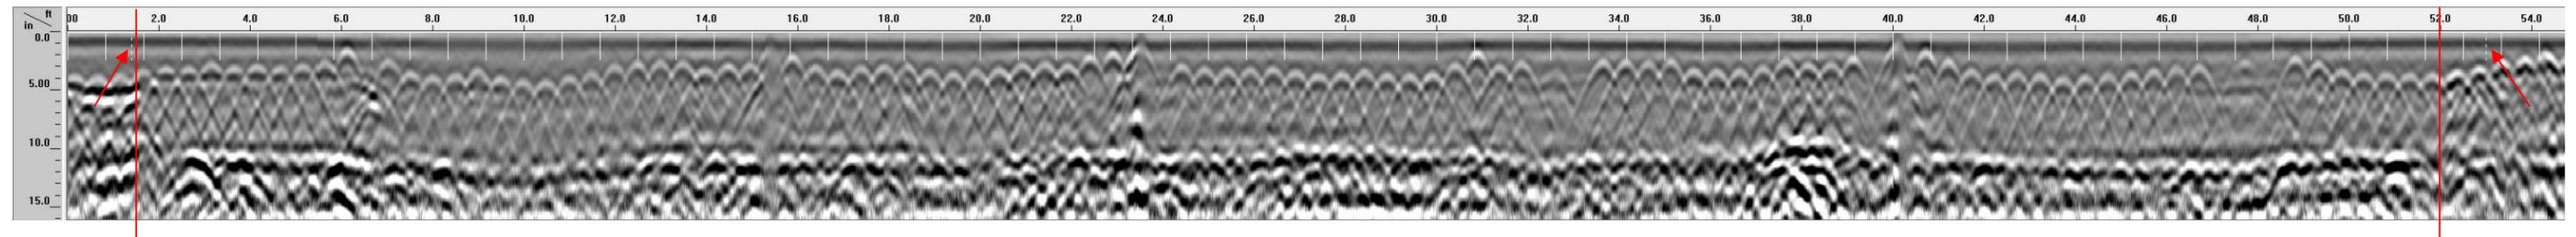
GPR profile F033.dzt and F034.dzt showing the basement space from the curbline (red arrows) toward the Twin Beans and Moose Hill buildings. The longitudinal rebar in both the upper and lower mats is visible (arches). The basement space begins about 1 foot from the curb line, or roughly 15 feet from the edge of the buildings.
